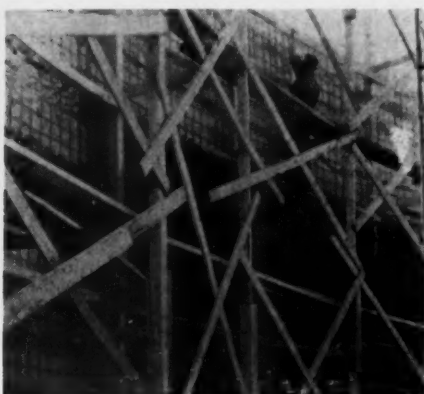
Single Coat of Gunite Over Reinforcing Mesh of Interior Wall
